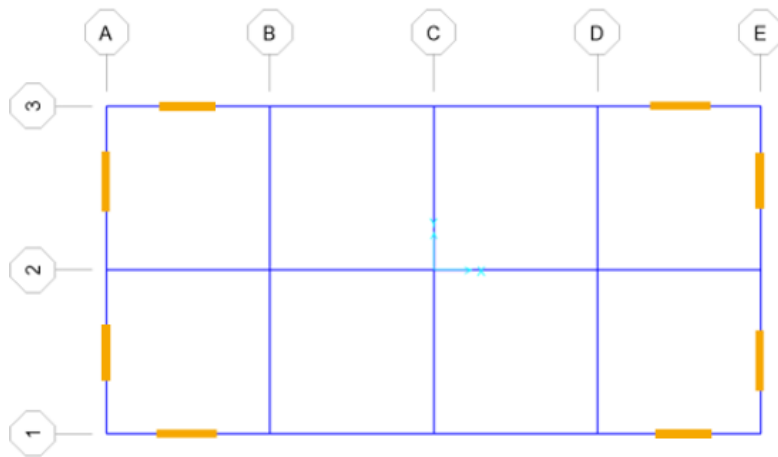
Positioning of reinforced concrete shear walls (yellow segments) in plan view, for the Italian case.
